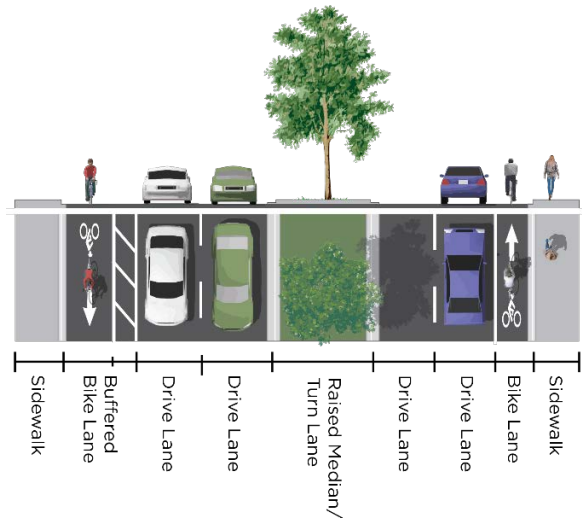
Potential San Pablo Dam Road Cross Section - Morrow Dr to Amador St
